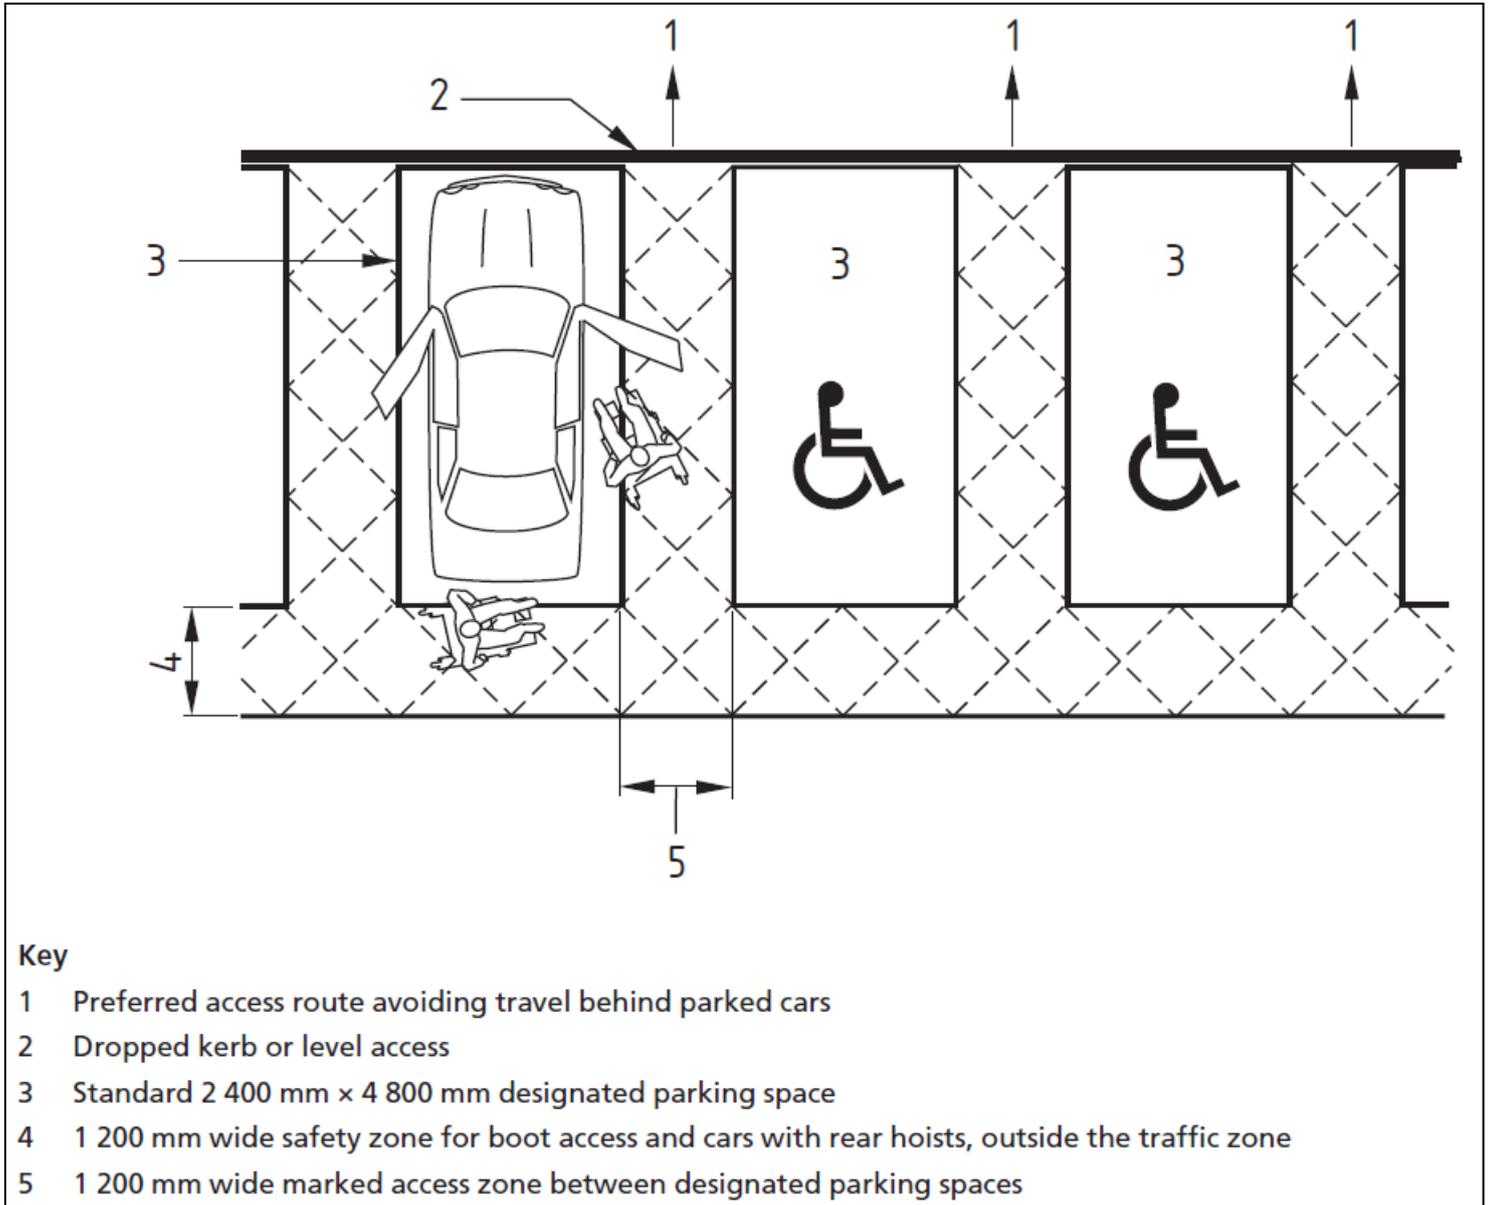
Example of a designated on-street parking bay (dimensions in millimetres)
